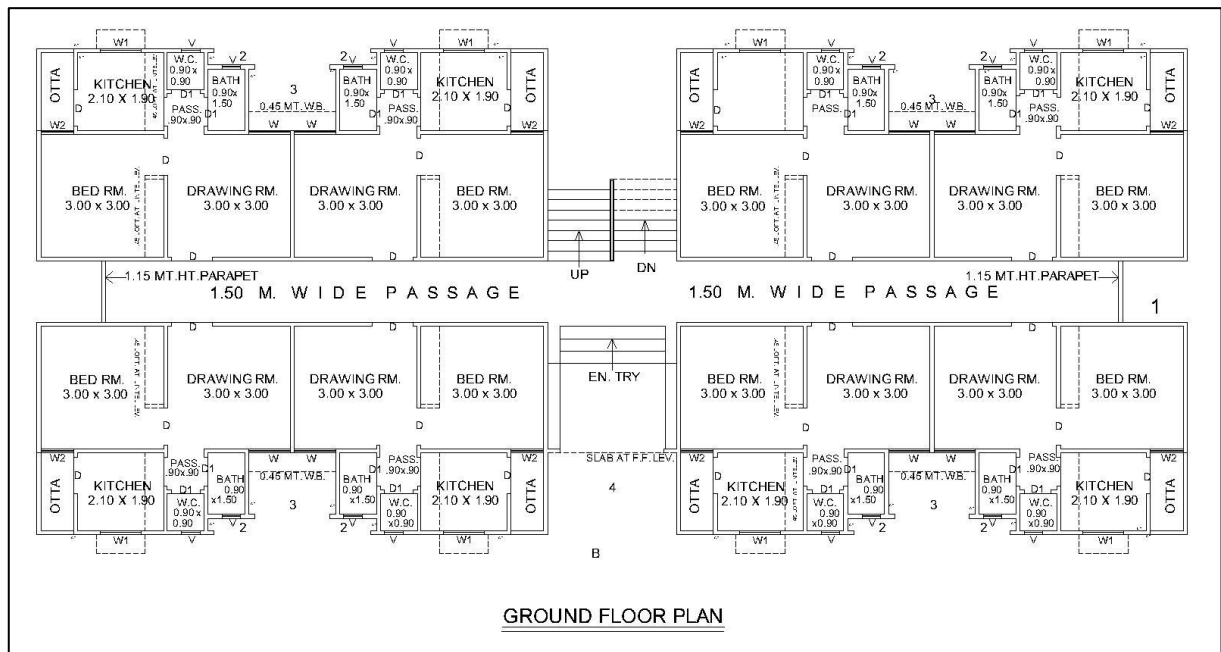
Typical layout plan of BSUP unit and BSUP Block in Ahmedabad
